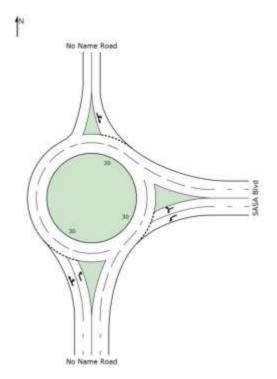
Future layout of SASA Boulevard Roundabout C
